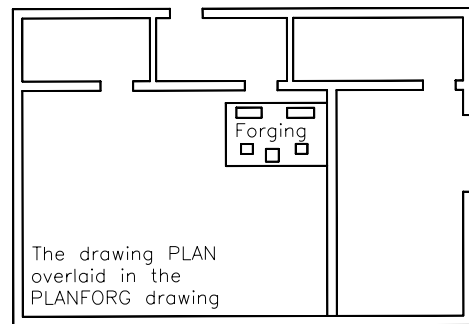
The PLANFORG drawing after overlaying the PLAN drawing
